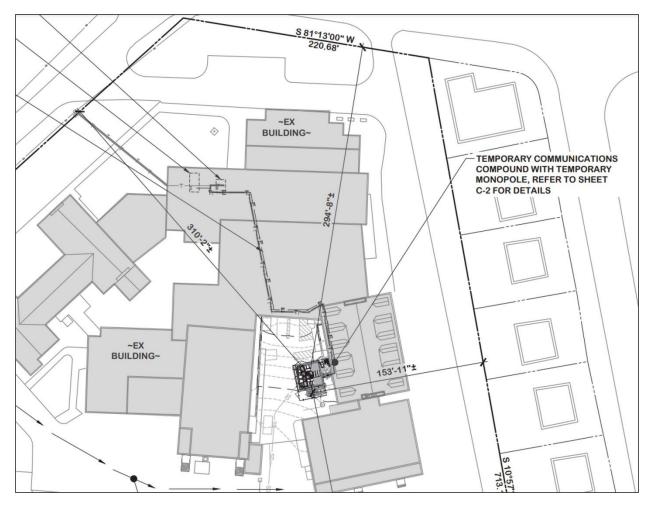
Site Plan with Proposed Temporary Telecommunications Tower Location
